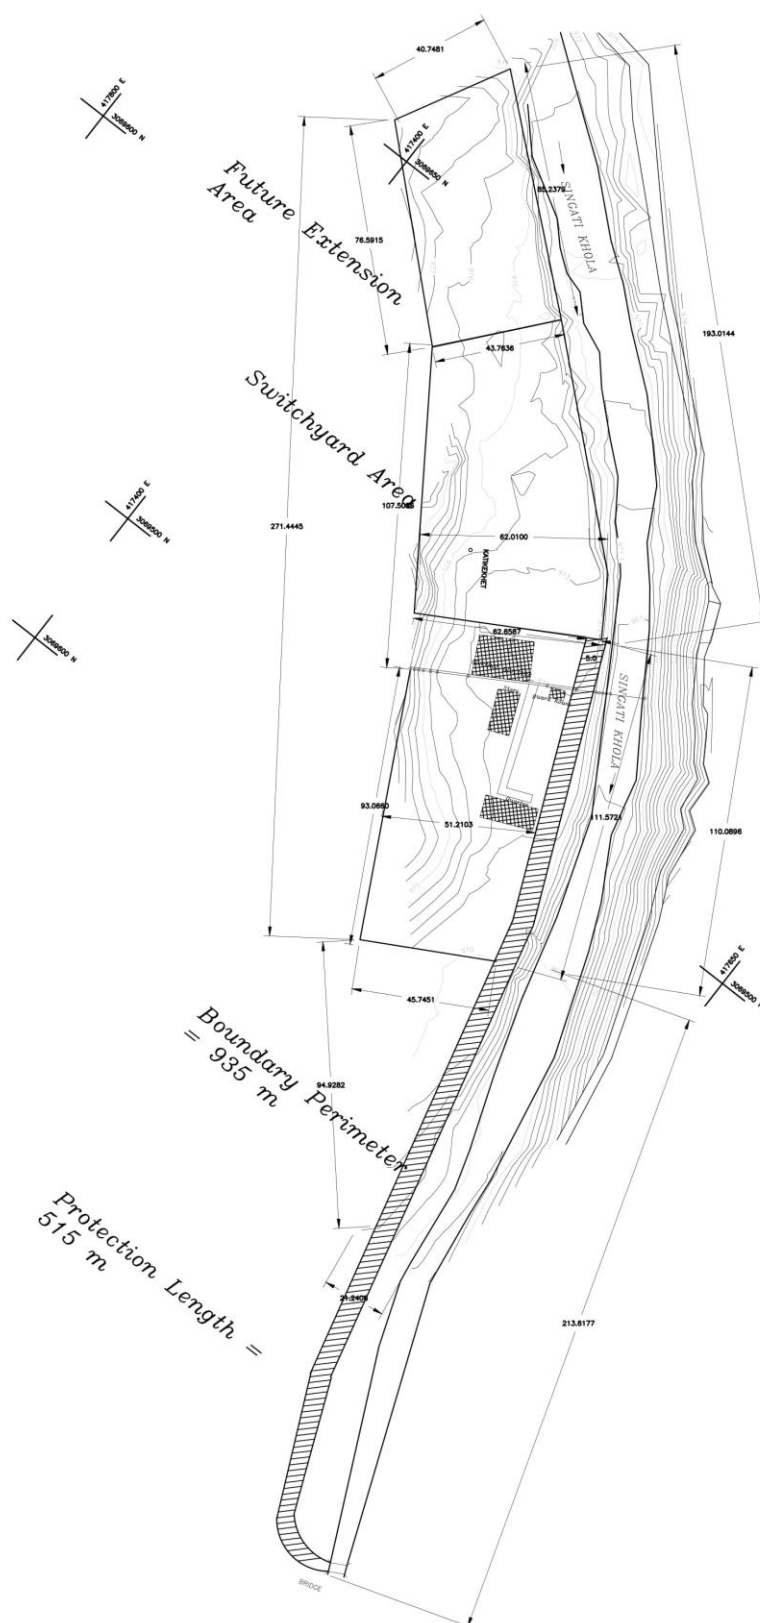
Layout Plan w/ Transmission Line Route Indication
